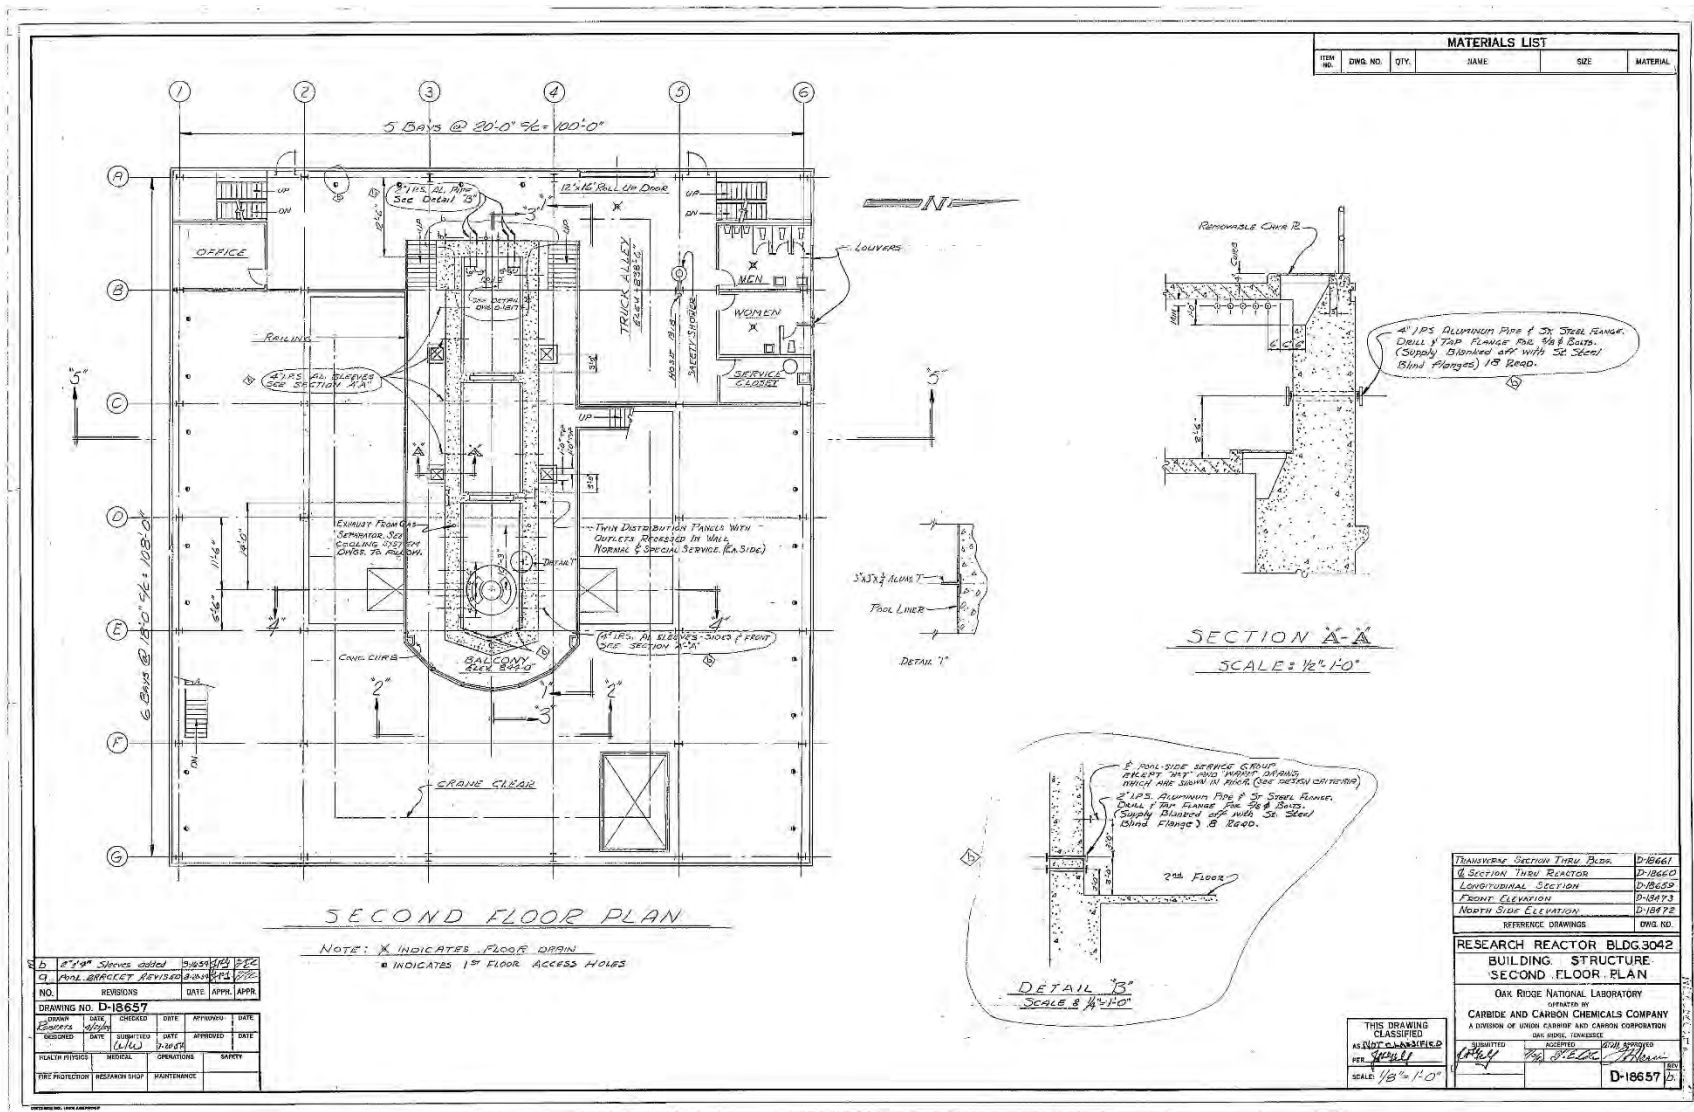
Second floor plan for Building 3042, including section (Oak Ridge National Laboratory, April 27, 1954).
